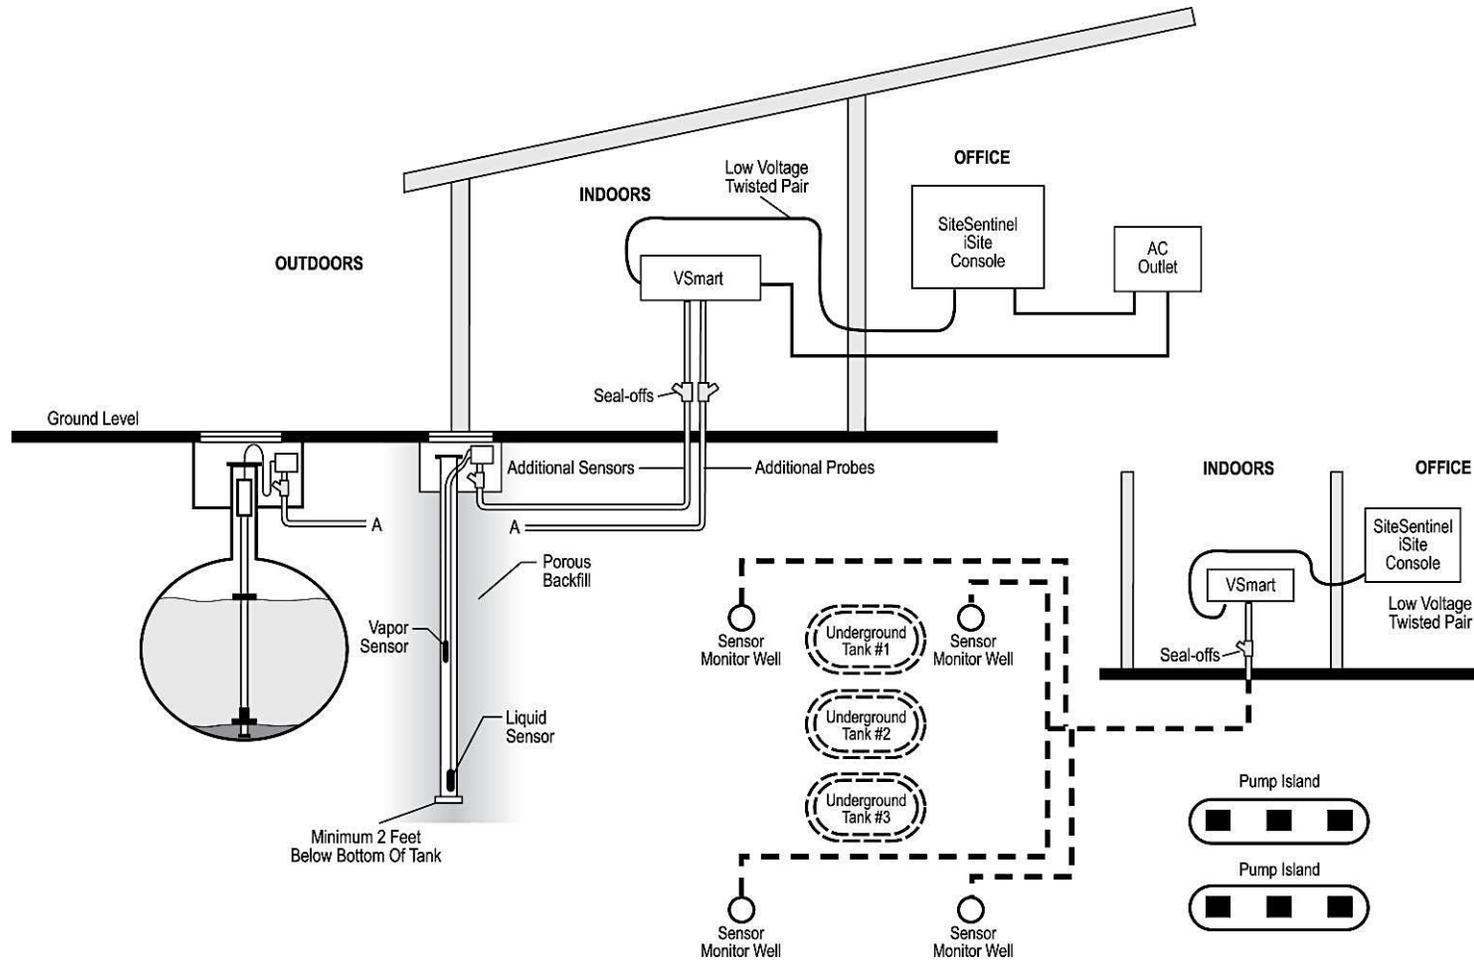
Wet-Well Monitoring, Single-Wall Tank
